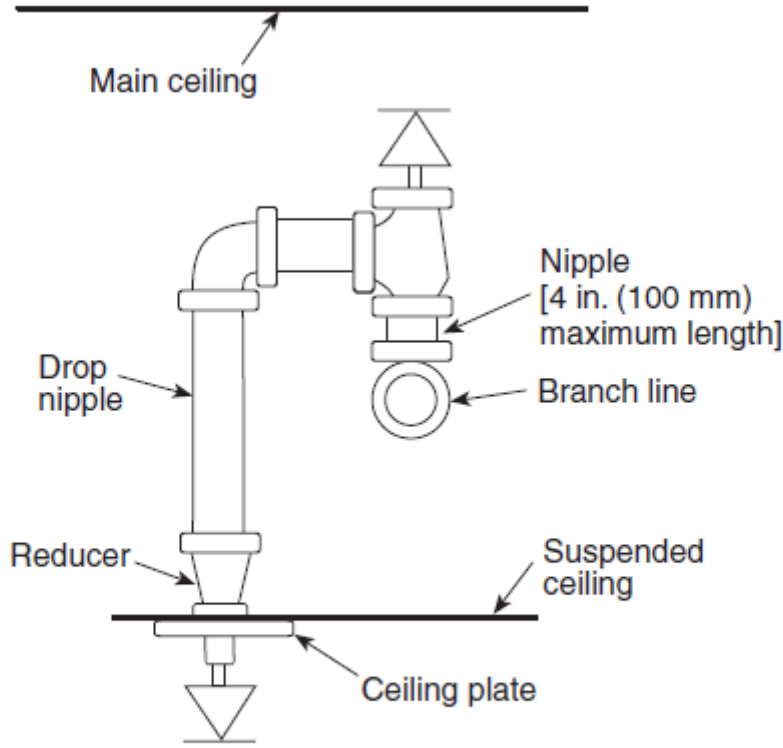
Sprinklers in Concealed Space and Below Ceiling.
